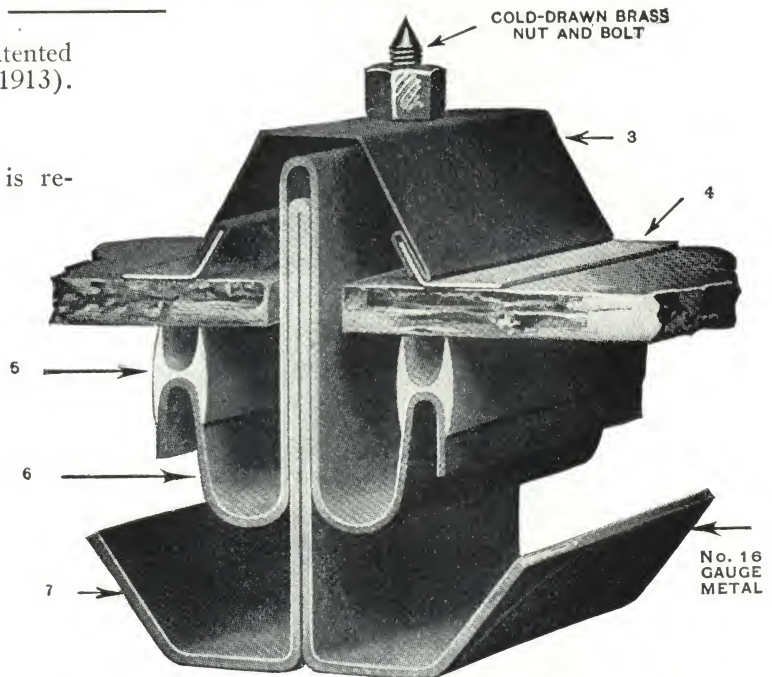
Complete Bar Assembled, Showing the Glass and Details of Construction
